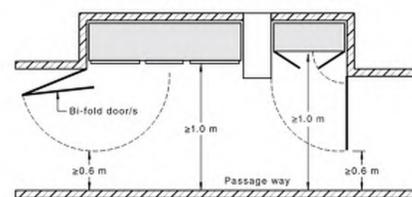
ACCESS TO SWITCHBOARDS—SWITCHBOARD DOORS THAT OPEN INTO ACCESS WAYS OR NARROW PASSAGE WAYS
